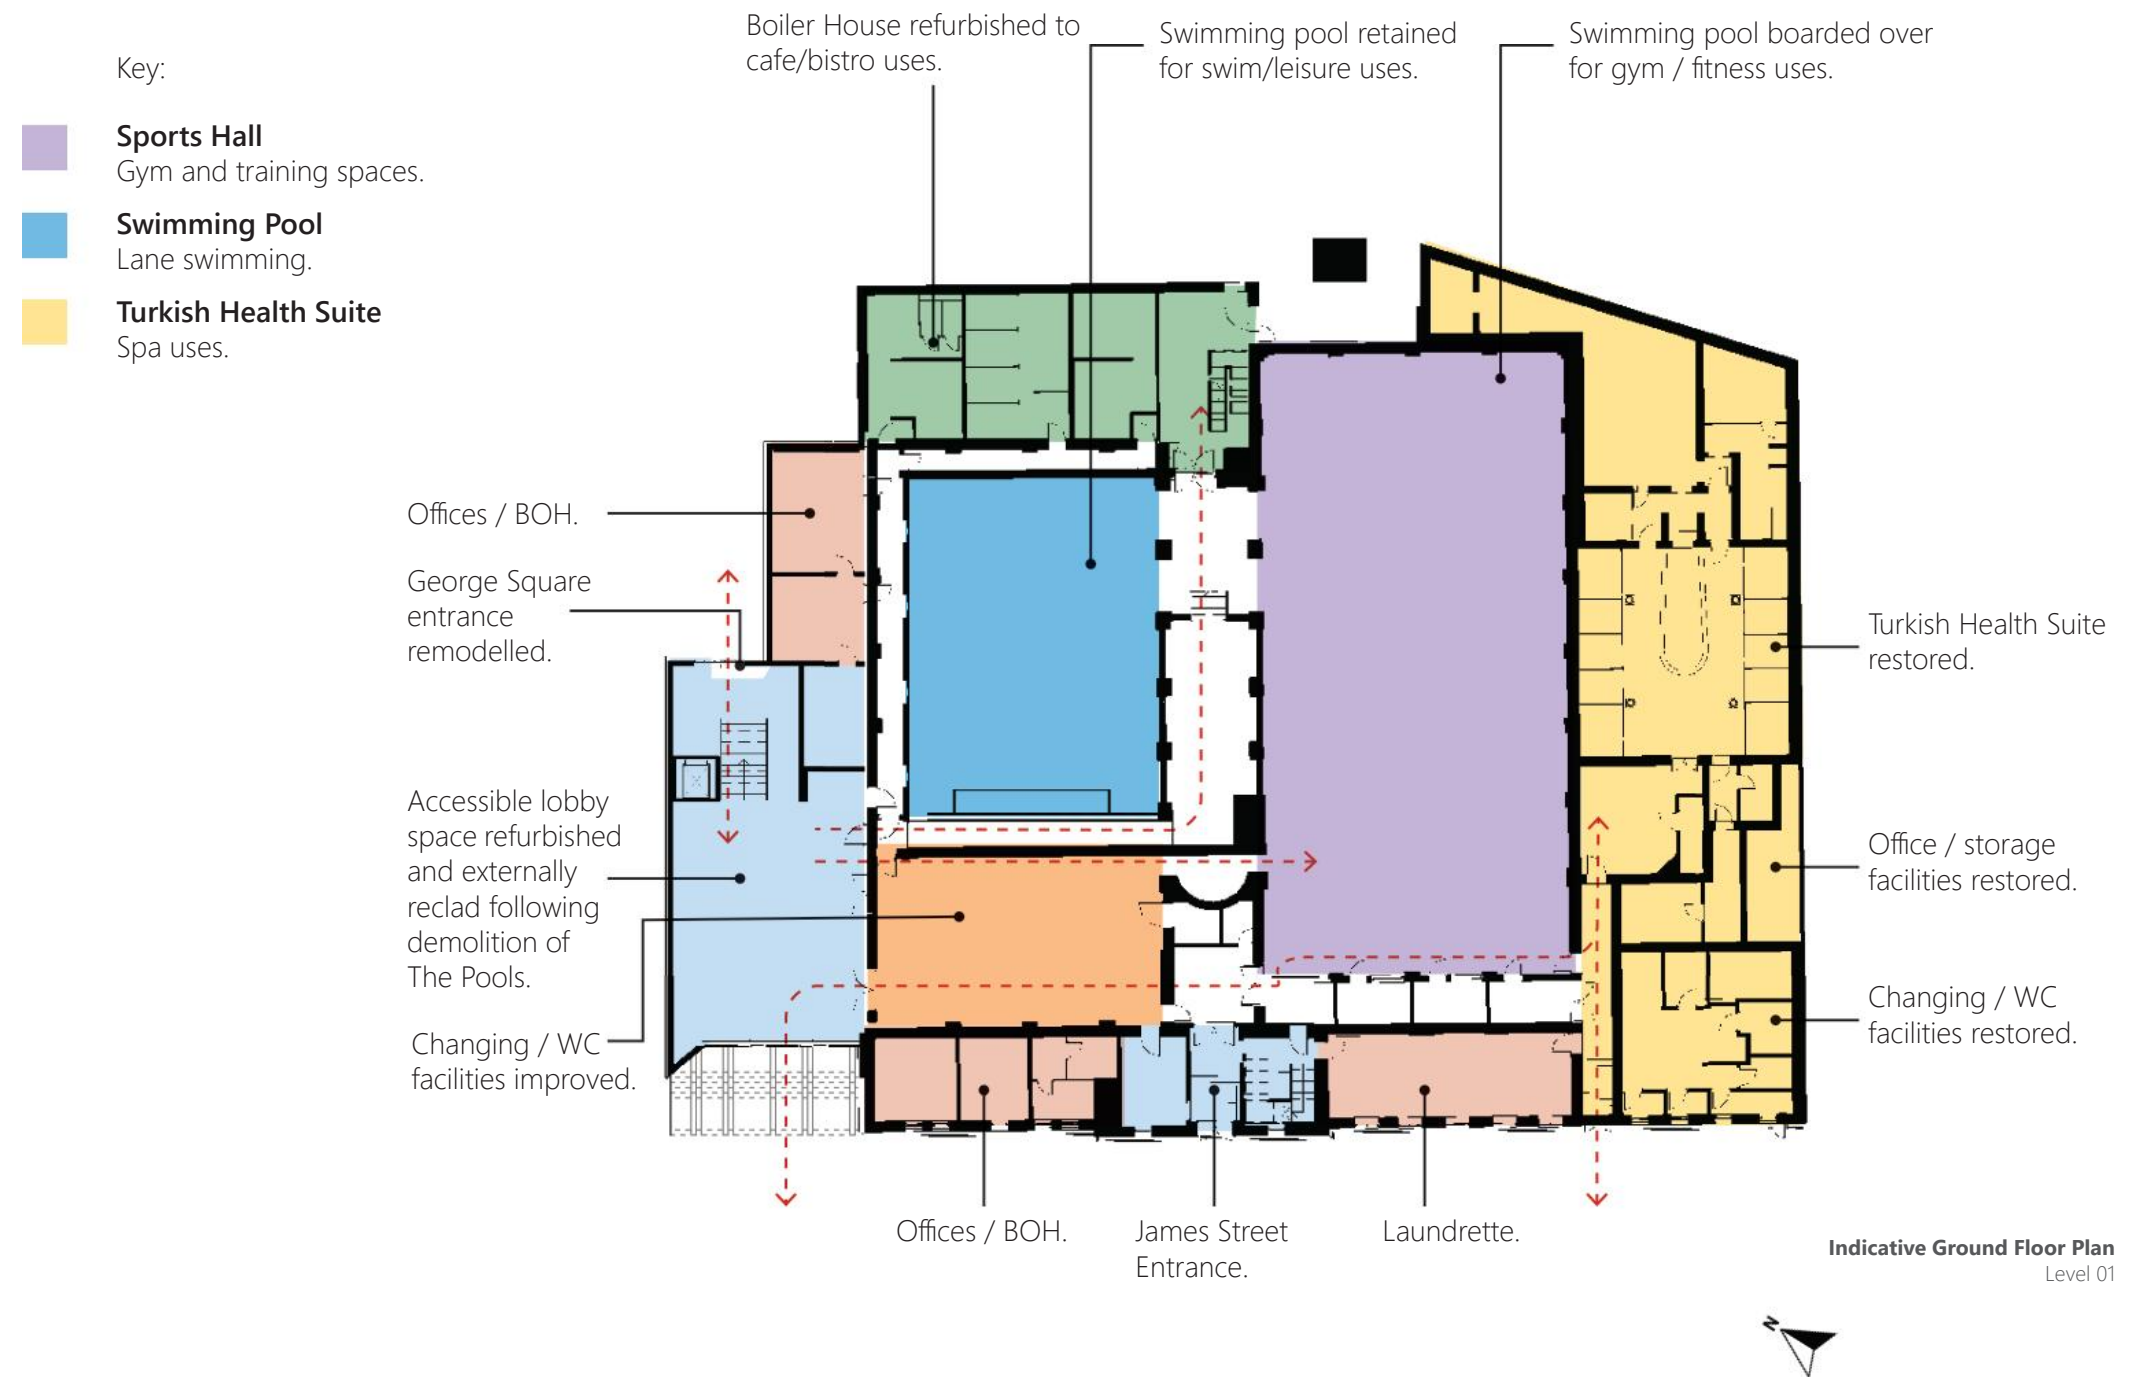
Ground Floor Plan, option 1, indicative use layout as proposed Level 00
